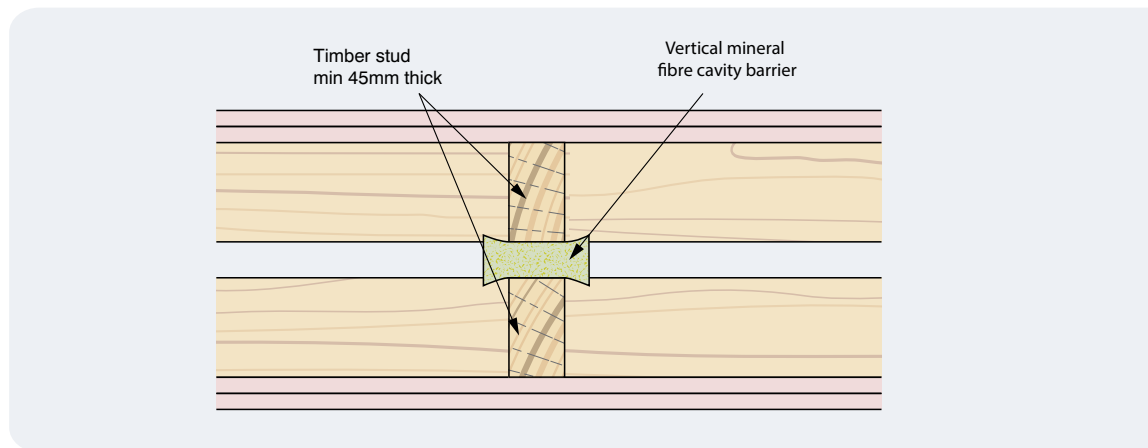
Intermediate vertical cavity barrier in double stud wall.
